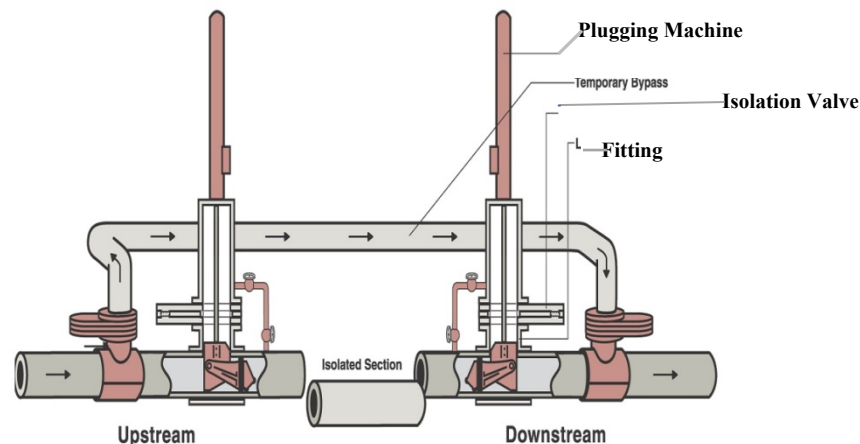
Plugging heads and temporary bypass conducting flow around isolated pipe section
